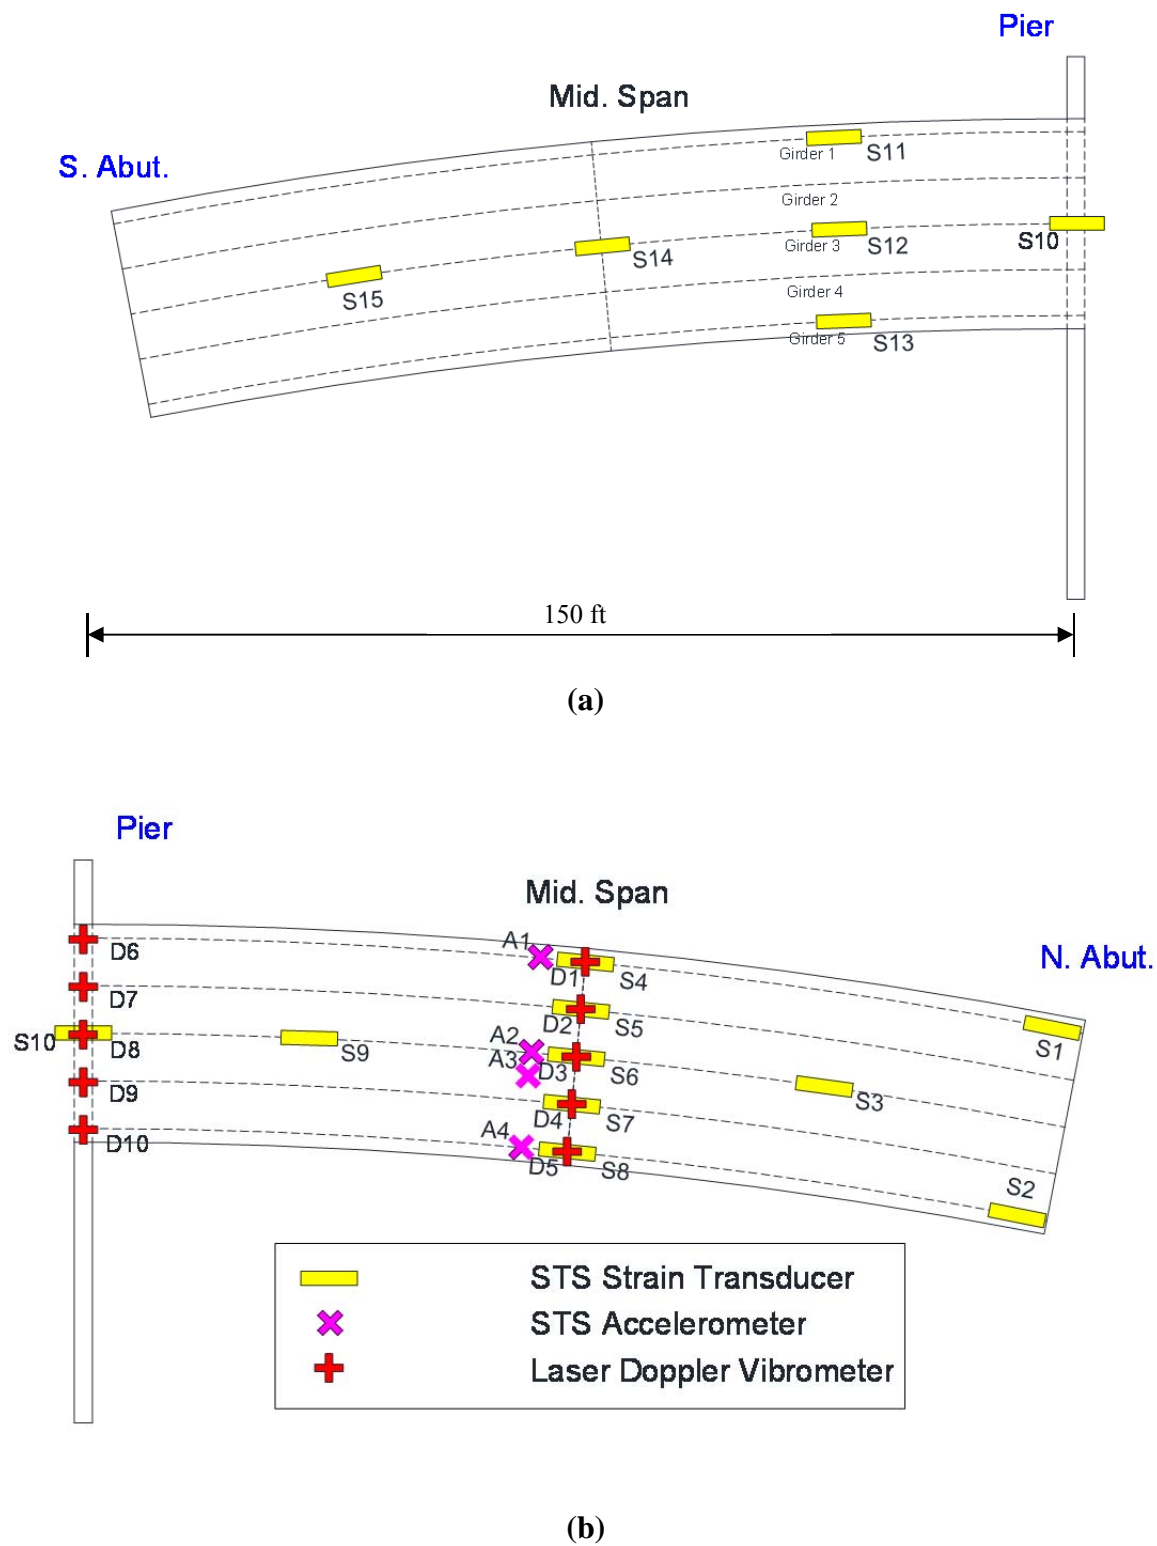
Instrumentation plan: (a) Span 2, (b) Span 1
